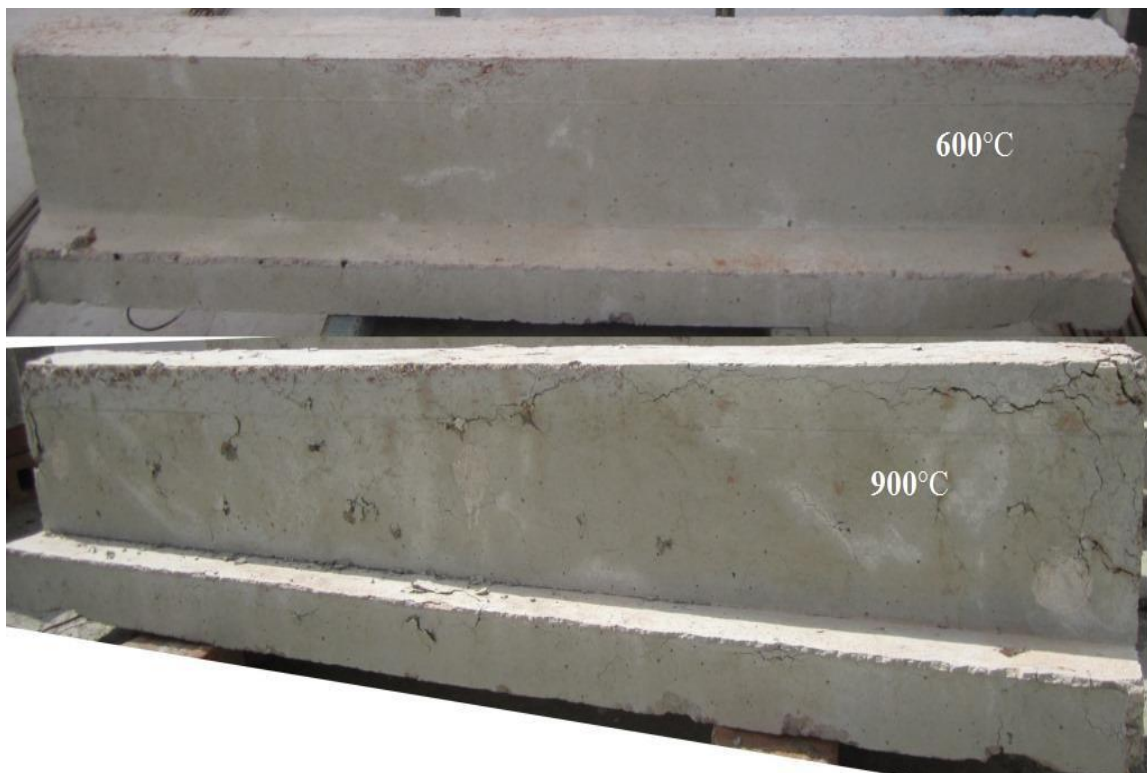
Surface cracking observed in test specimens exposed to 600°C and 900 °C
